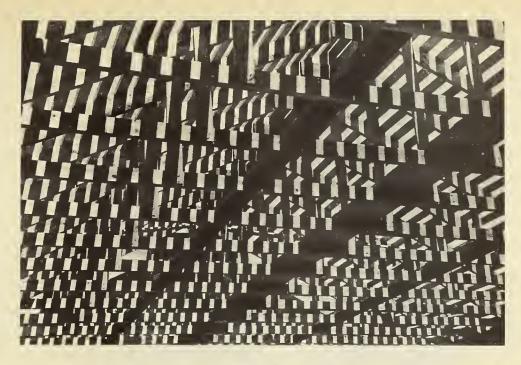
HOUSE - ROOF LATH & ROOF TRUSSES F.S.A. PHOTOGRAPH 11561M1 - LEE
